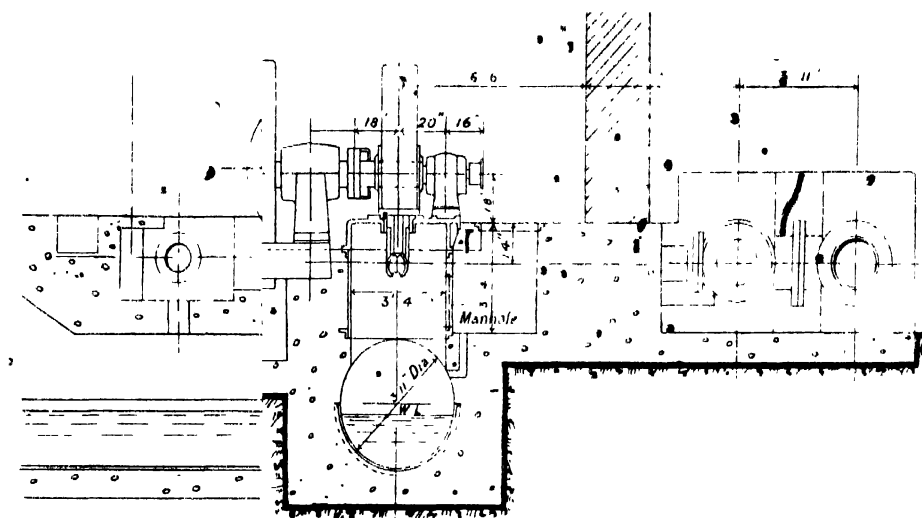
shows two Pelton wheels of the single-wheel single-jet type. It will be noticed that a flange coupling is used, and that part of the weight of the runner is supported by one of the generator bearings, thus reducing the number of bearings to three. It will also be noted that the lower portion of the concrete tail race is metal lined. This is a very necessary precaution in the case of a high-head installation, in which the deflected jet may impinge with destructive effect on the bottom of this race.
